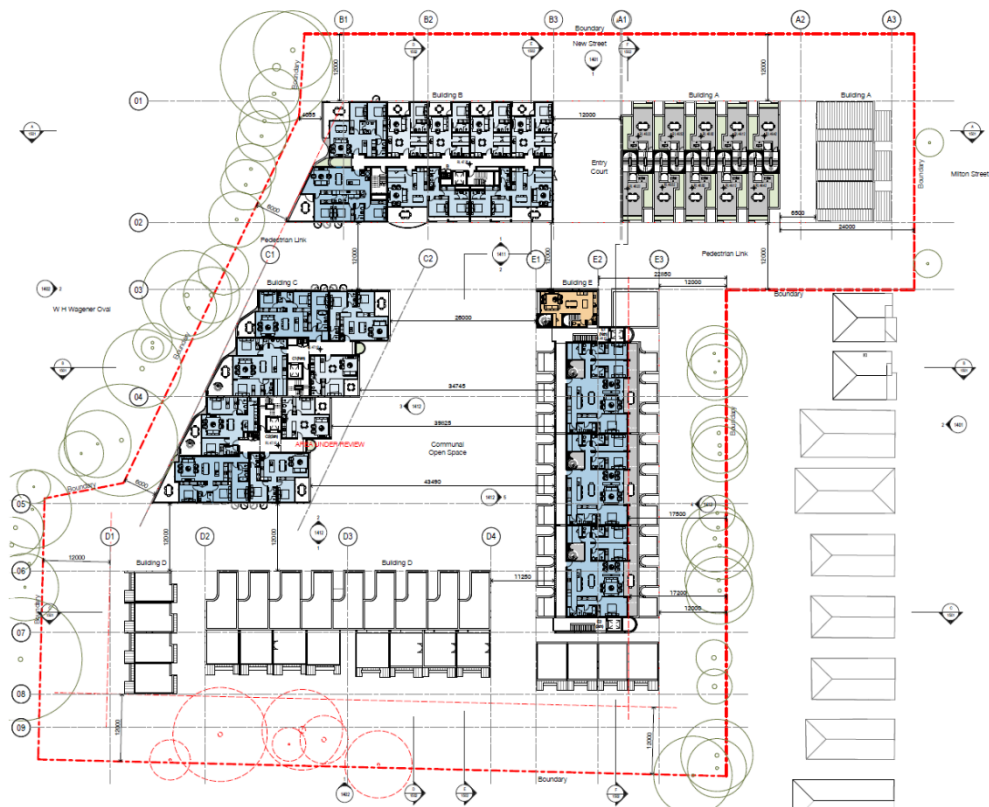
Proposed Overall Level 3 Plan. (Source: SJB Architects)
